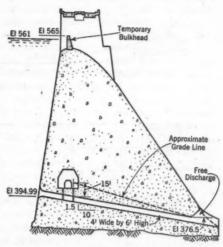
Section Through Overflow Monolith and Outlet Conduits, Norfork Dam
